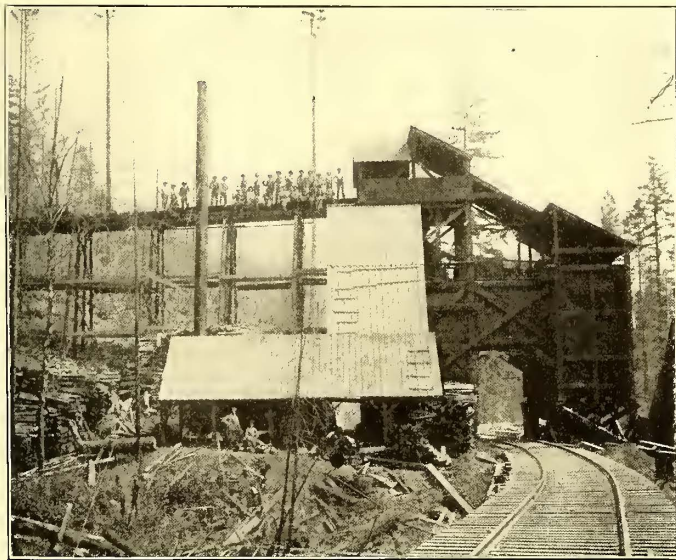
ROCK CRUSHER PLANT AT CAZADERO
